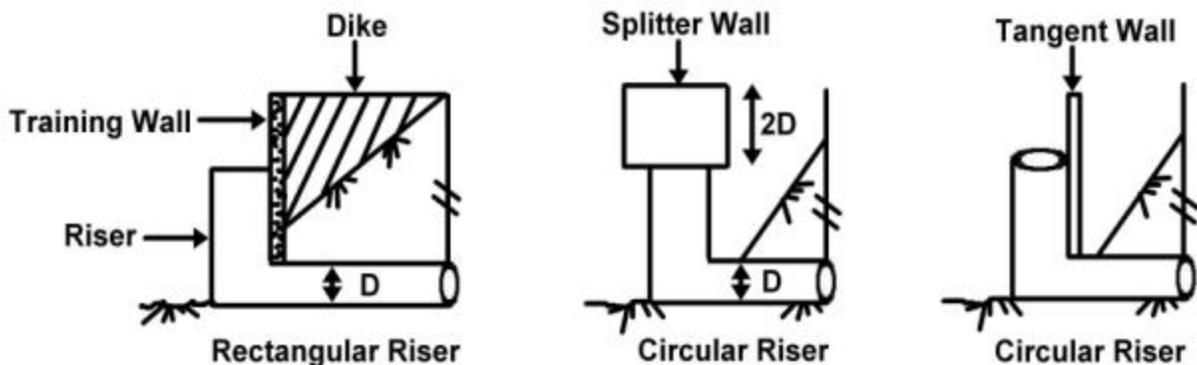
Anti-Vortex Wall on Riser Pipe
